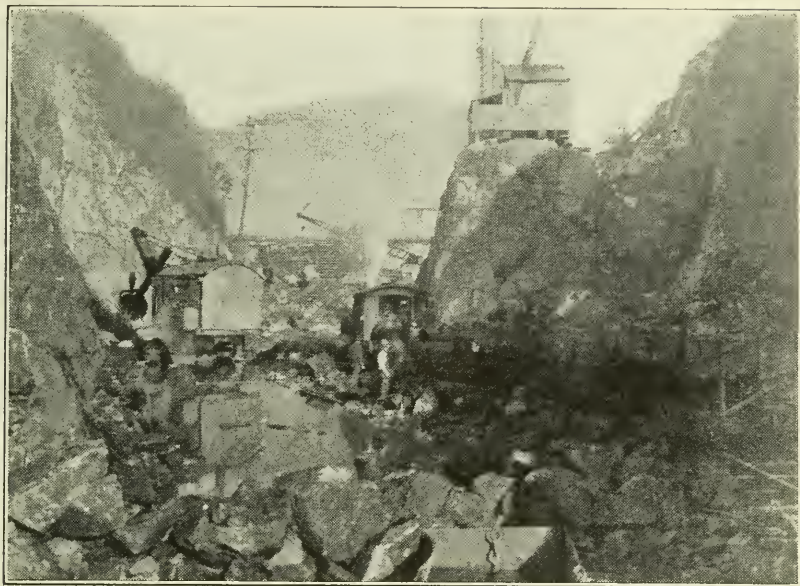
EXCAVATING IN HETCH HETCHY DAM SITE AT STREAM BED LEVEL. CRIB DIVISION DAM IN BACKGROUND.
